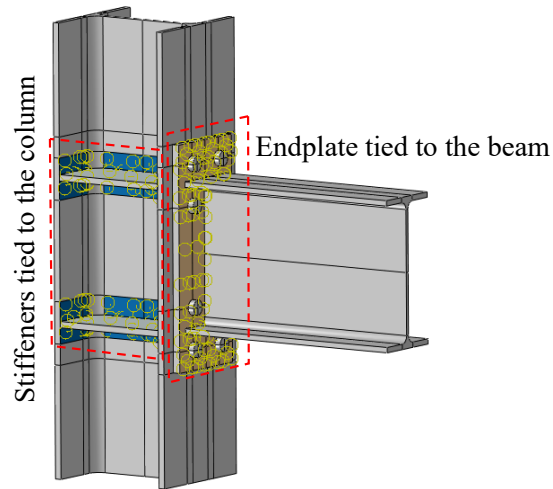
“Tie” constraints for modelling welds – endplate to the beam and stiffeners to the column.
